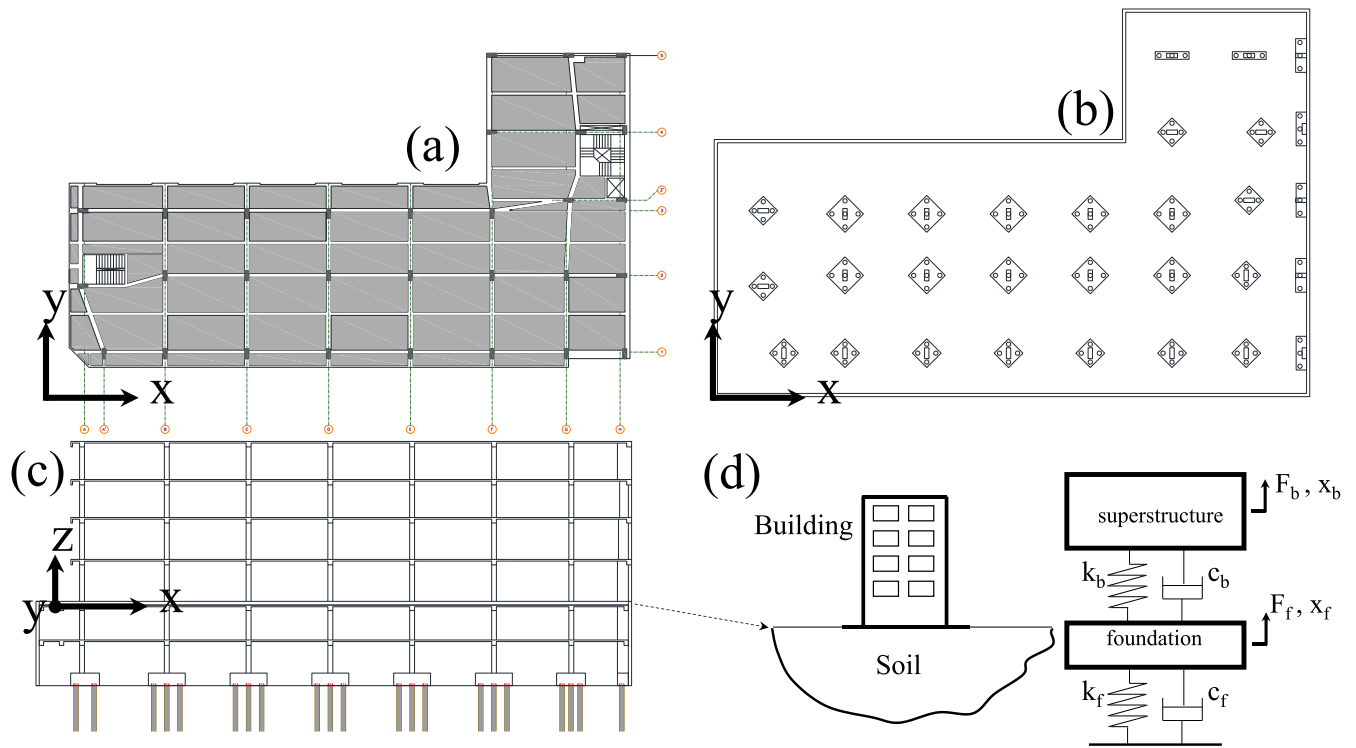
Building description, coordinate system and 2-SDOF system: (a) typical floor-plan view; (b) foundation plan view surrounded by walls; (c) elevation showing superstructure, underground floors and foundation, and (d) 2-DOF model to represent the system.
